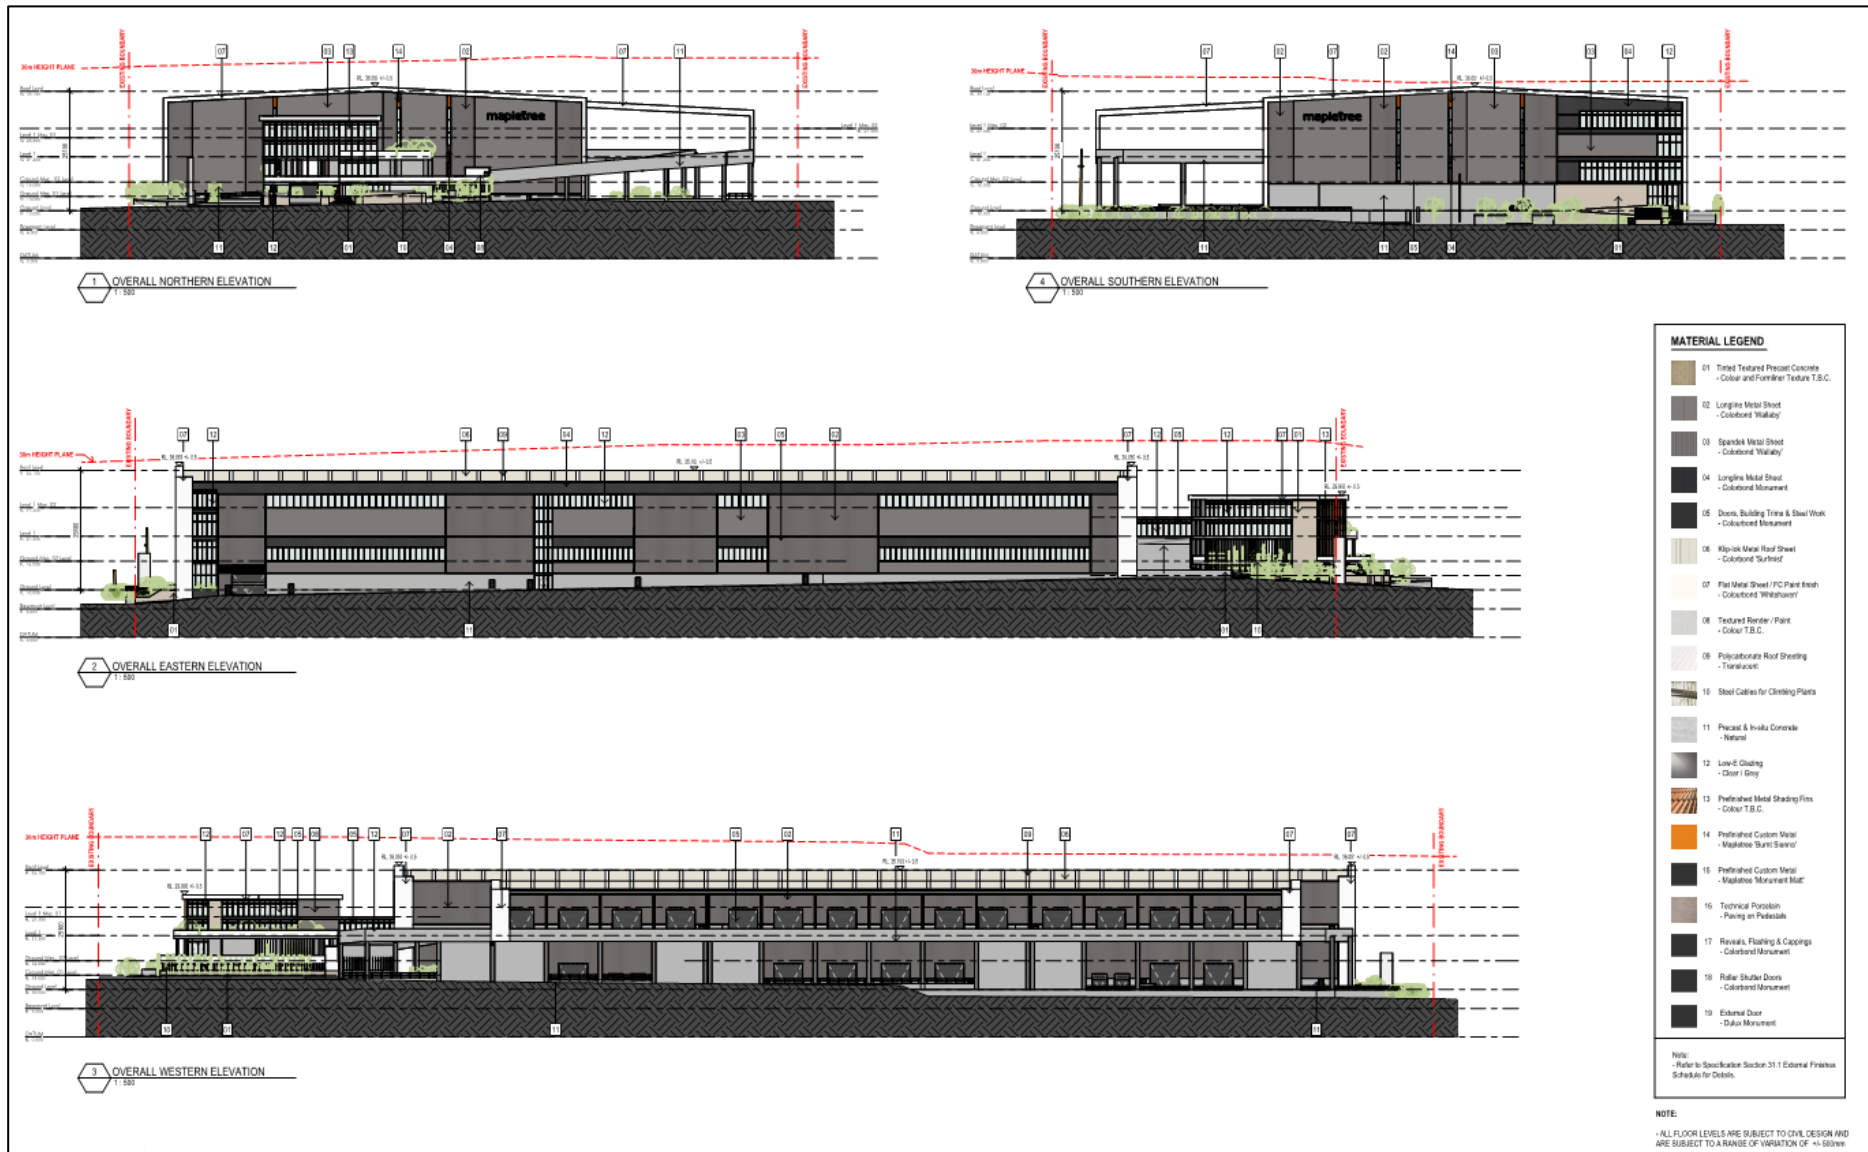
Proposed Elevations (Source: Nettletontribe, 2023)
